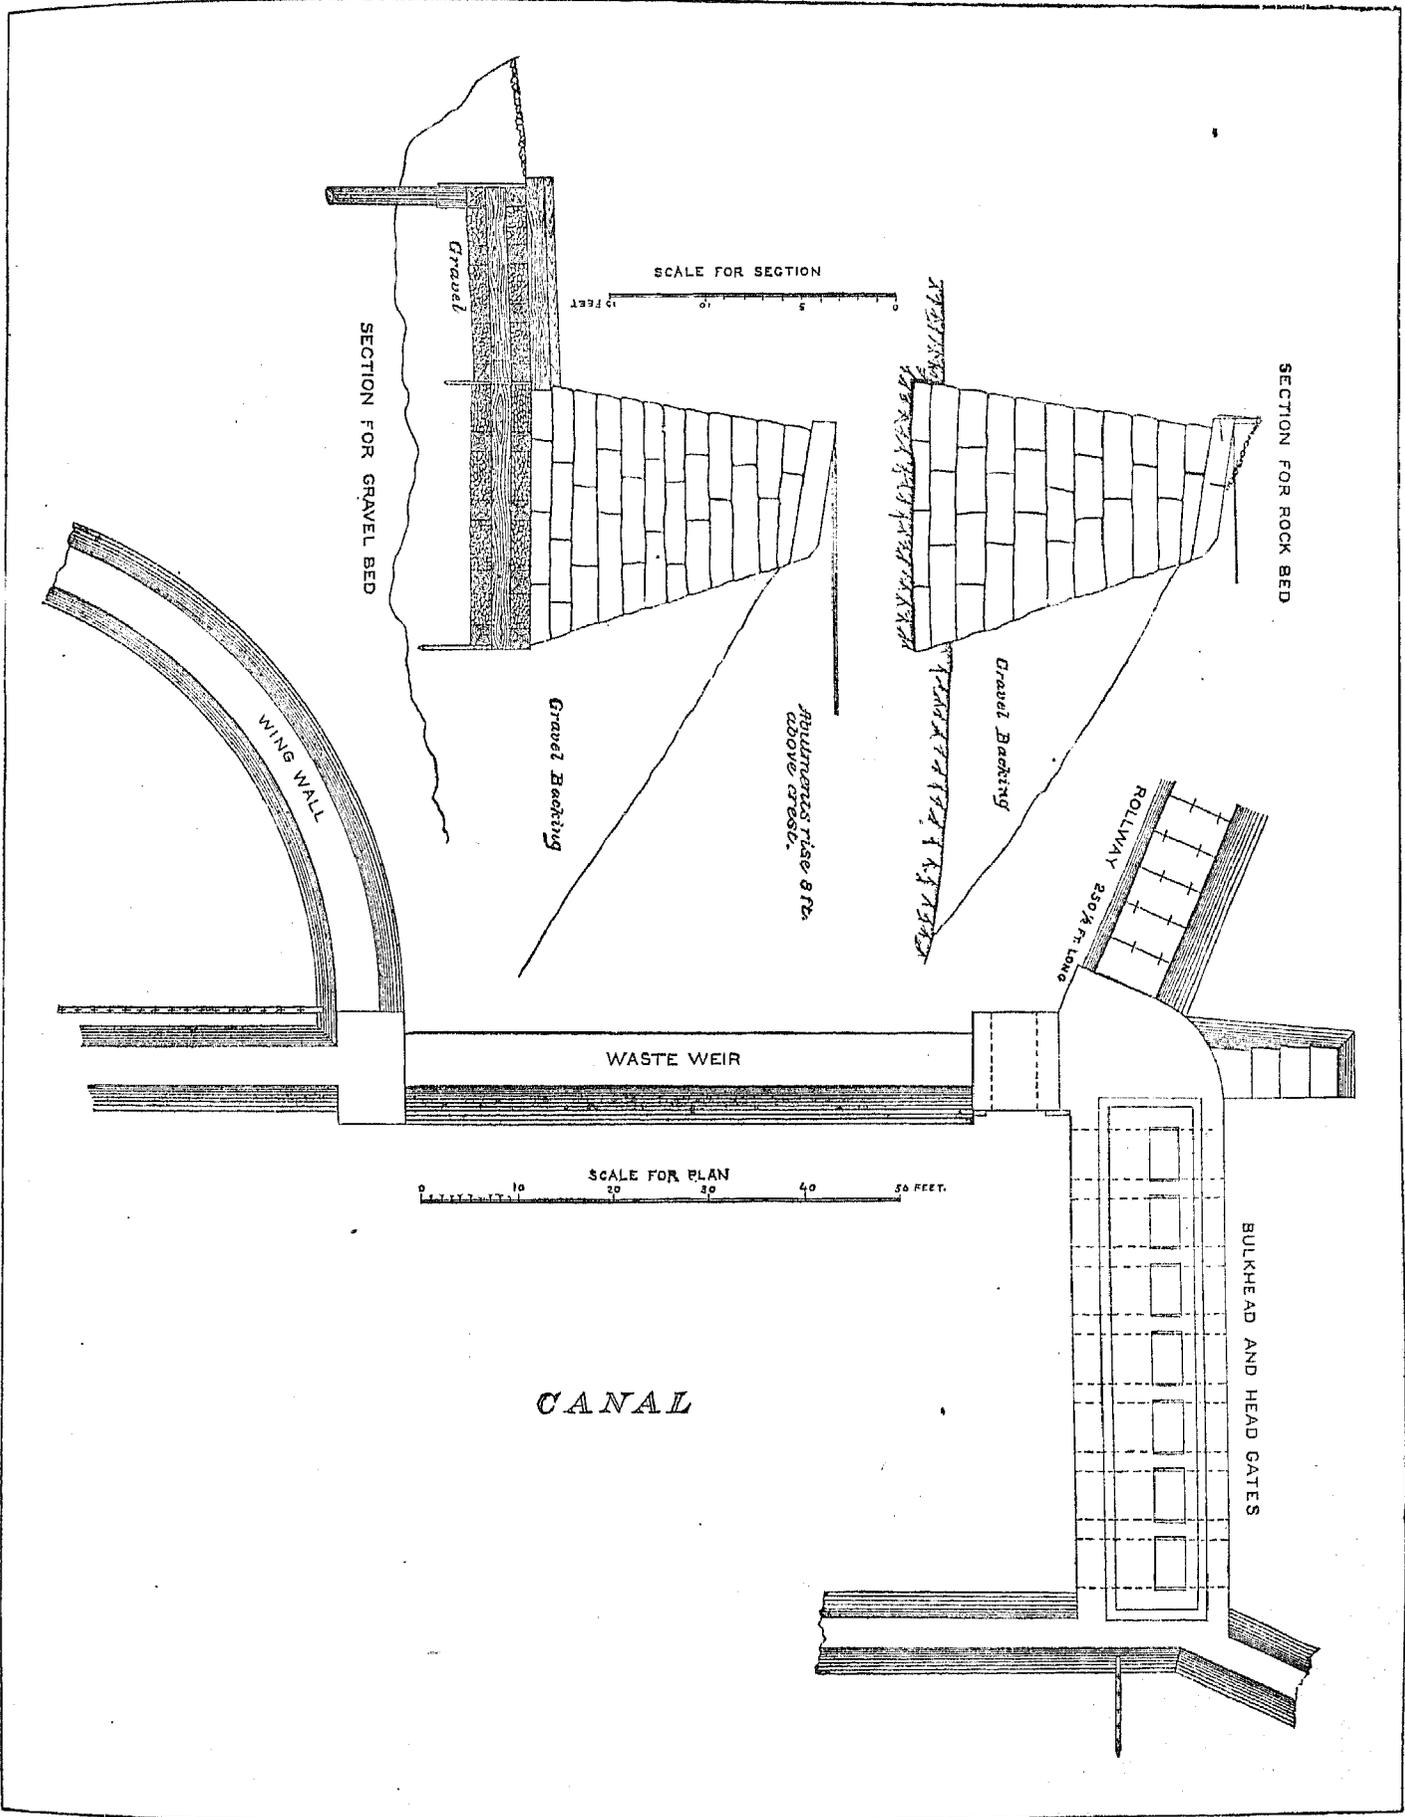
New Dam and Connecting Works at Southworth Falls.
